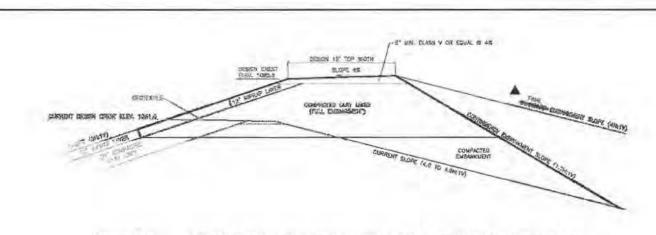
Pond 5 and 6 – dike and liner vertical raise: typical cross section
